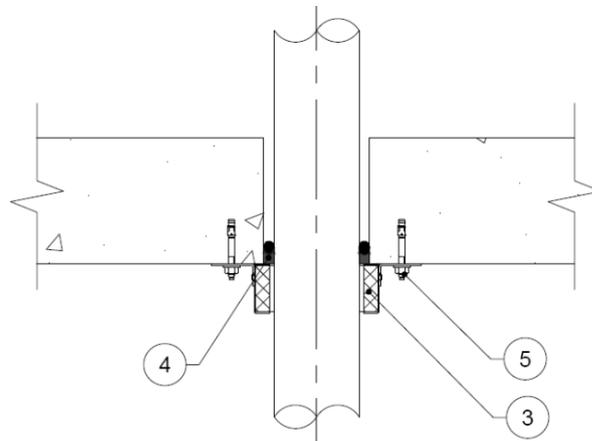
Sealant detail around uninsulated pipes in concrete floors option 1
